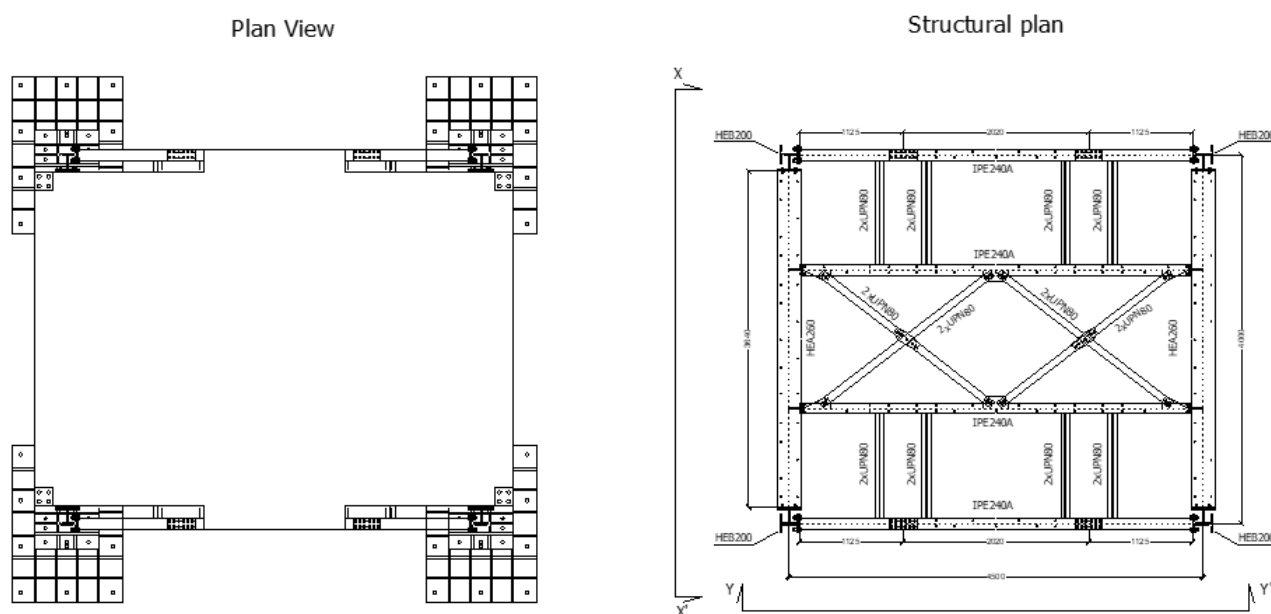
Structural plan layout of the mock-up: reinforced concrete deck and steel horizontal structure
